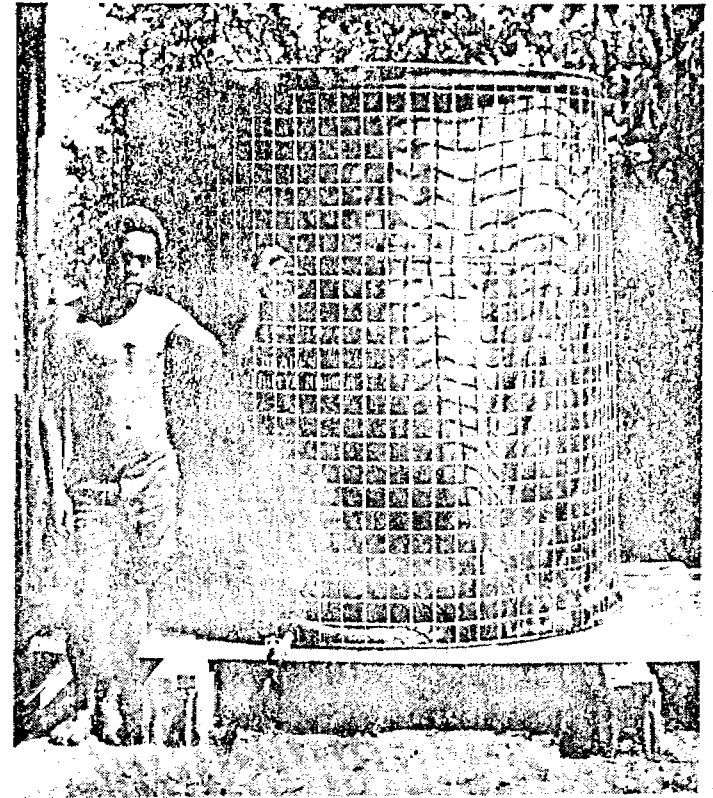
Butyl rubber membrane tank showing method of support by galvanised steel mesh cage
